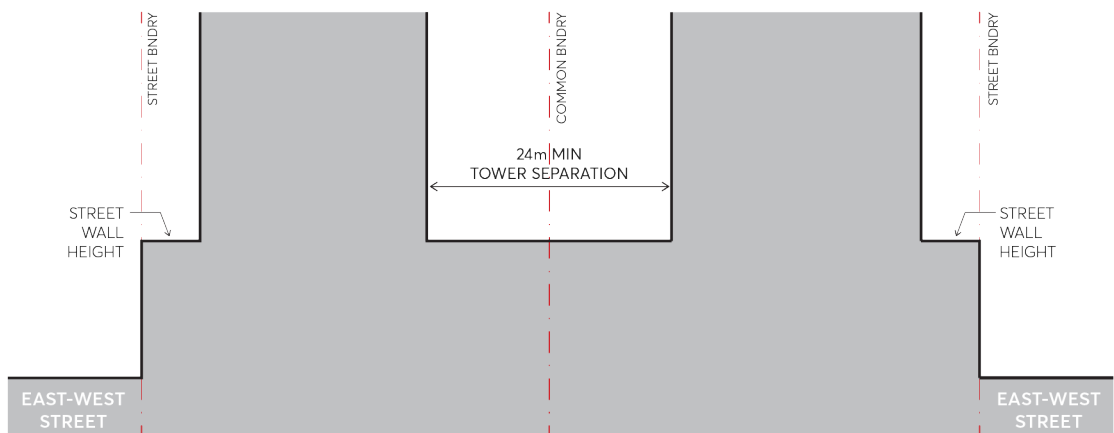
Tower separation between primarily north-south facing facades
